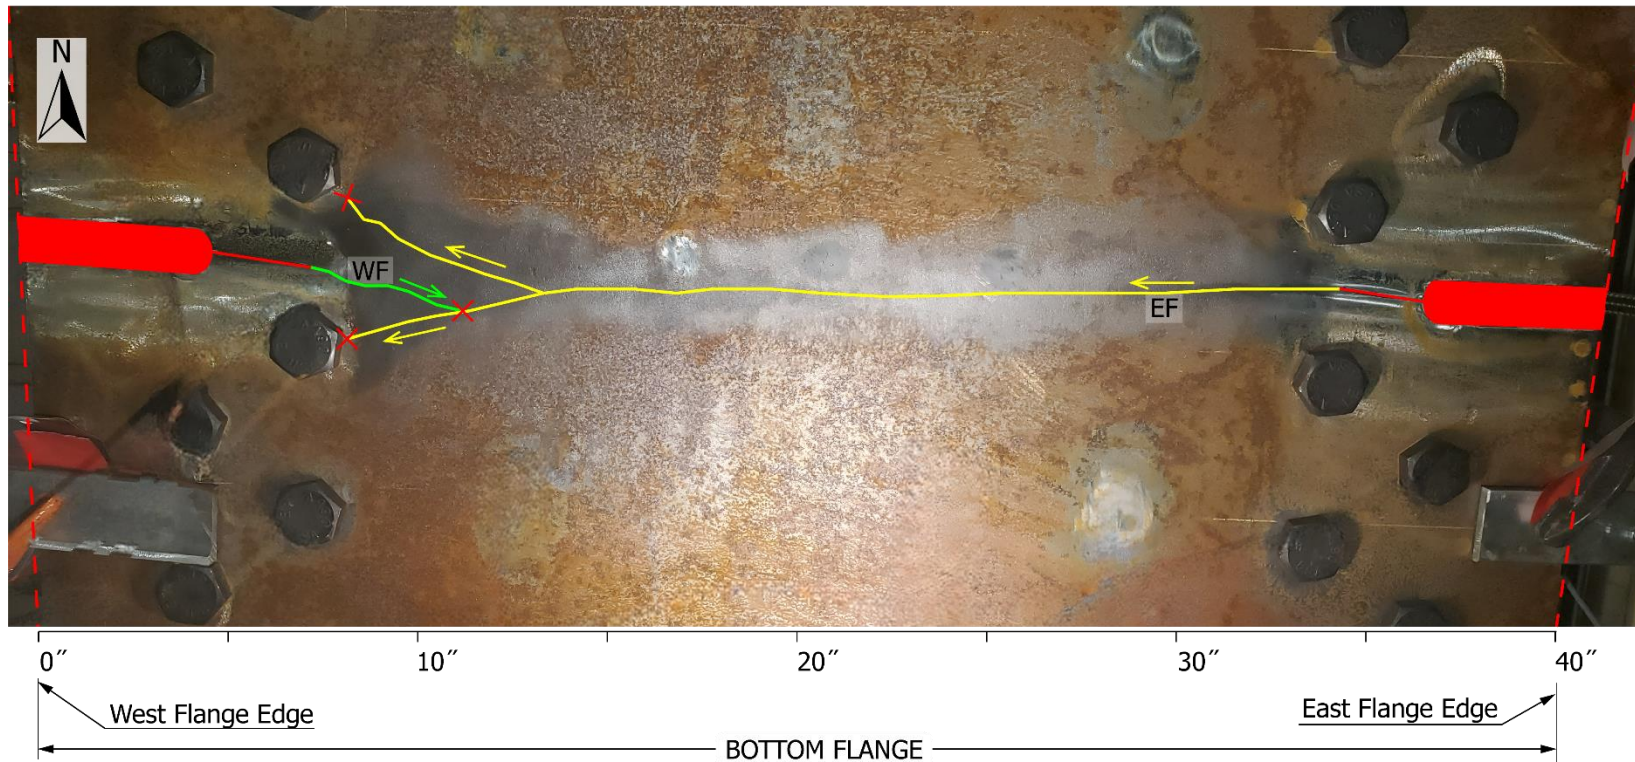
Specimen B1: cracks after completion of Fracture Test
